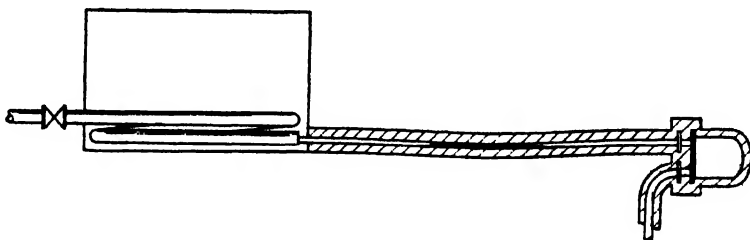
WATER AND STEAM LOCK IN LONG SAGGING CONDENSATE PIPE
